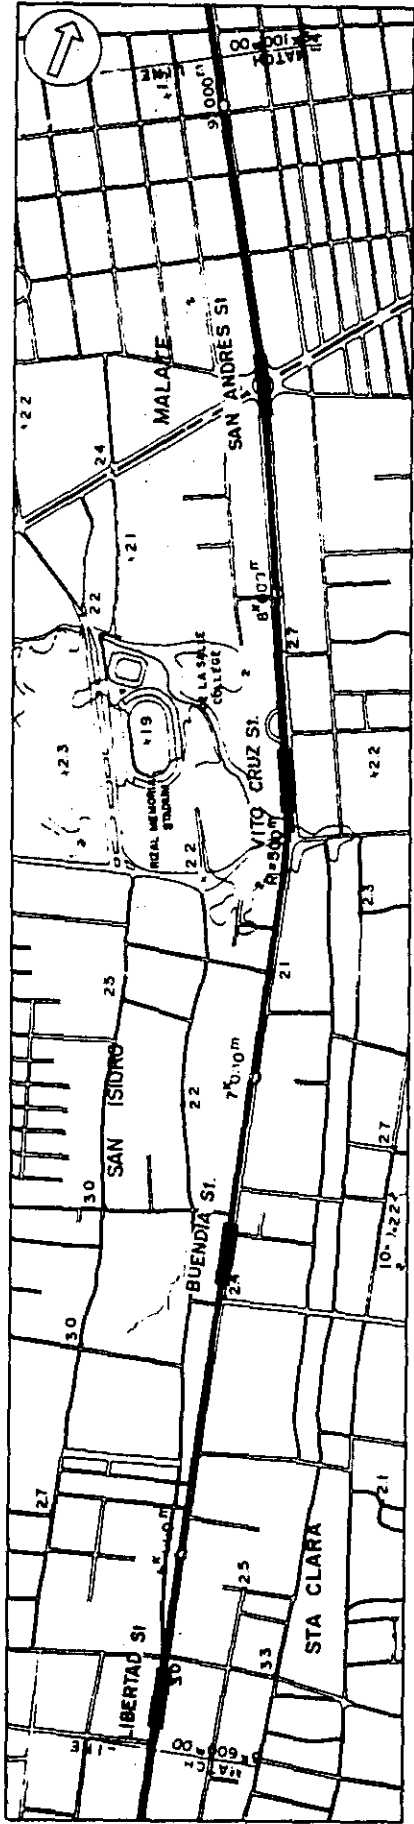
Plan and Profile of Recommended Alternative (2)
